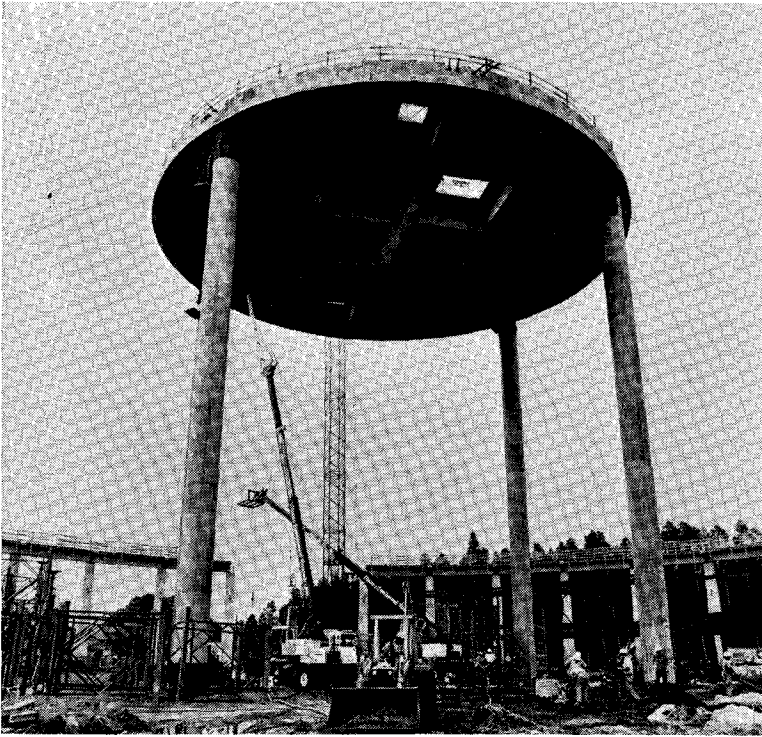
Completed center slab structure temporarily guyed to outer ring foundation.
